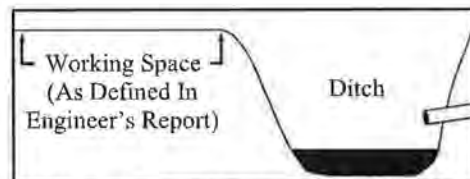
Cross-Section of an Open Ditch Municipal Drain
